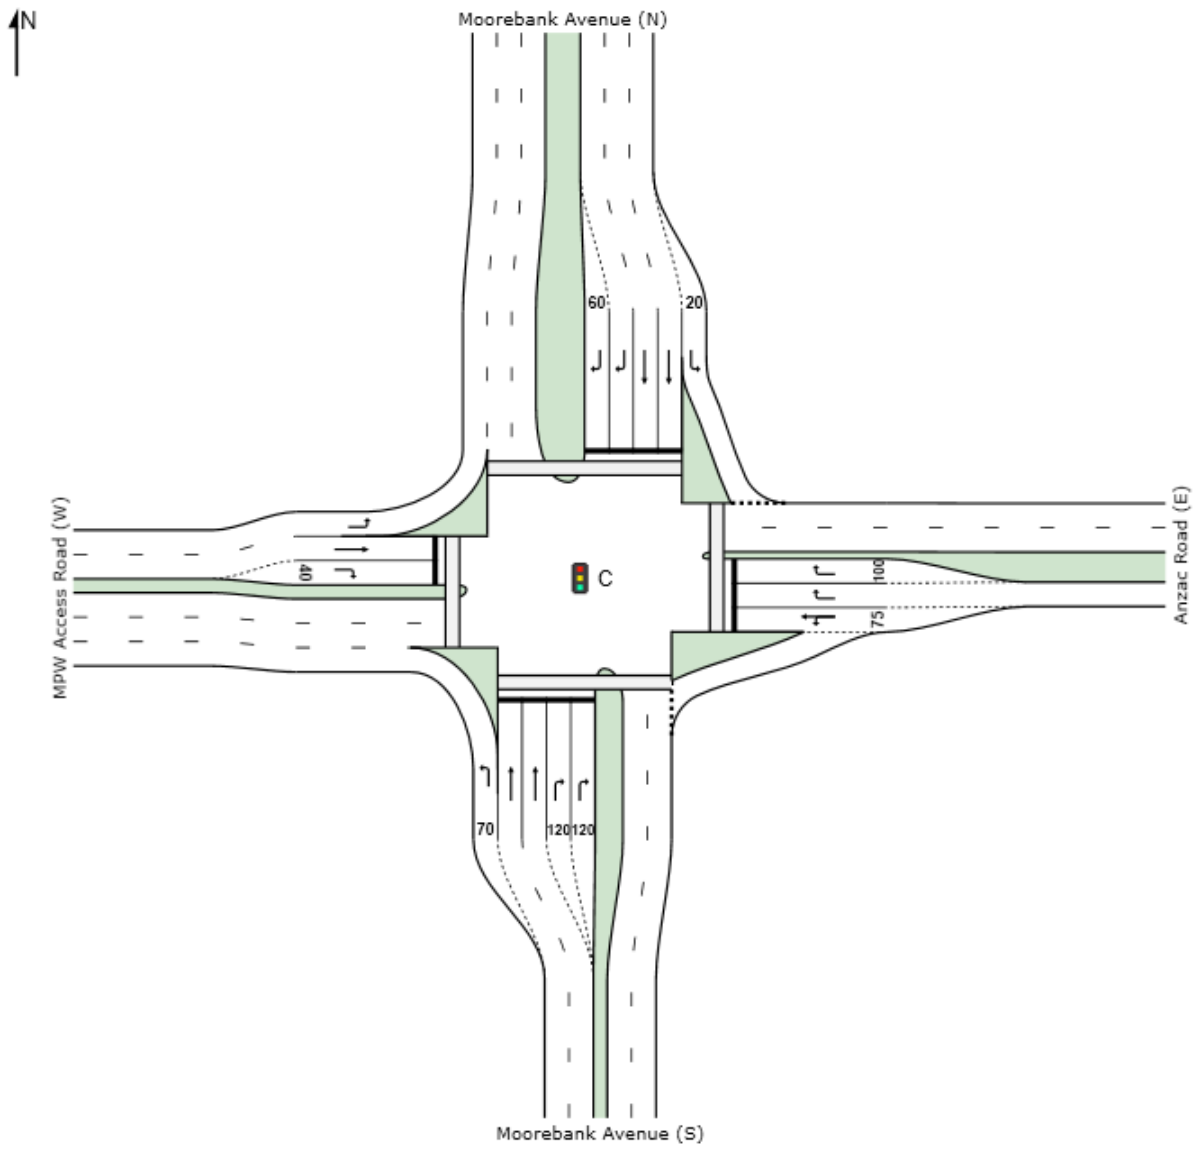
Upgraded Moorebank Avenue / Anzac Road intersection layout
